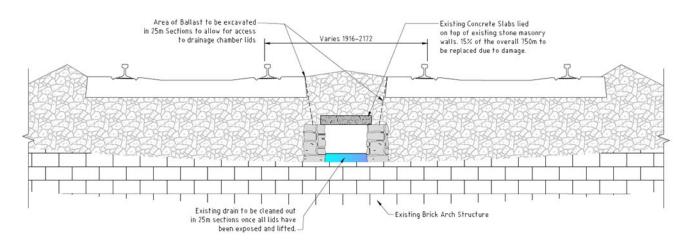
Typical section on Phoenix Park Tunnel showing existing drainage. Source: Phoenix Park Tunnel, drawing SDS-15-152-P03-022
